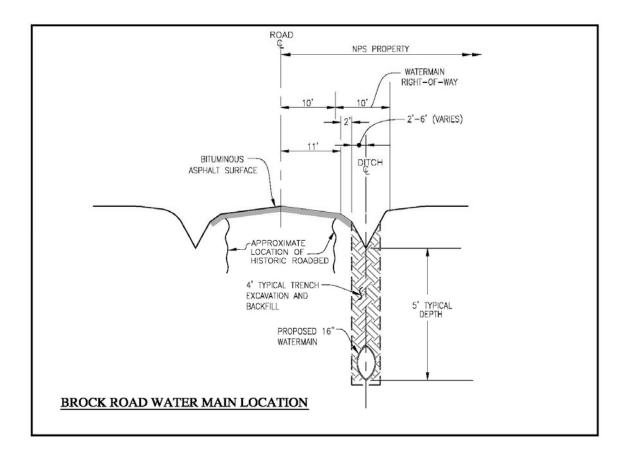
Proposed typical section for the Brock Road Alternative 16-inch water main.
